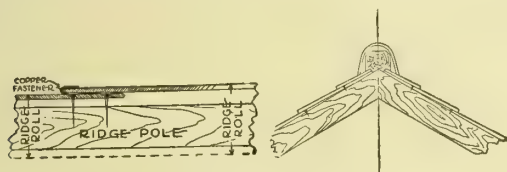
DETAILS OF RIDGE ROLL CONSTRUCTION
